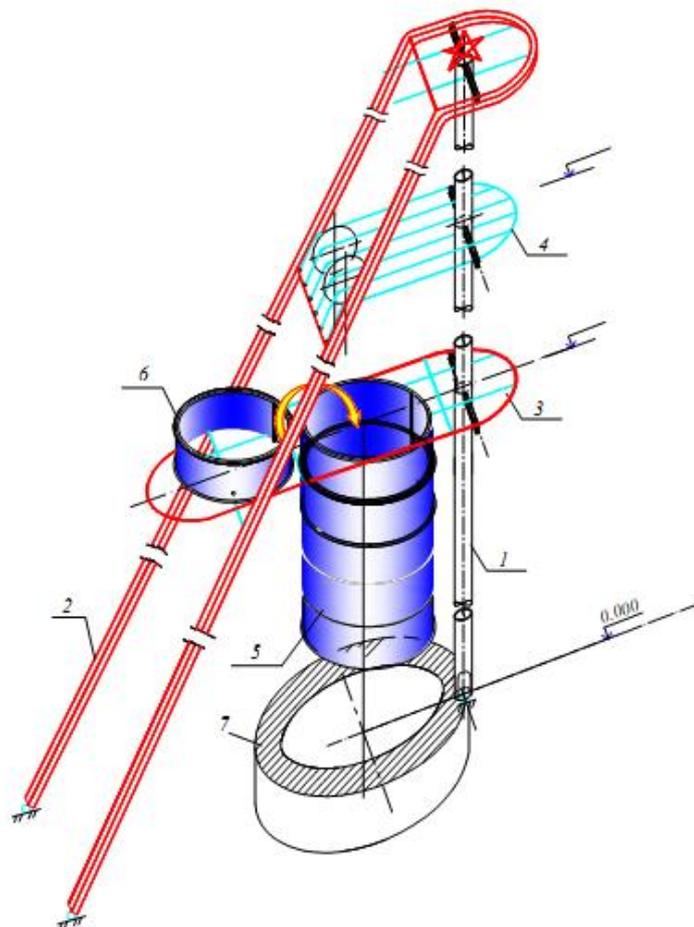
Scheme of assembly of driving sheave wheels platform: 1 – central tubular post; 2 – stay leg, 3 – driving sheave wheels platform, 4 – permanent sheave wheels platform, 5 – rig, 6 – ring element, 7 – shaft collar
